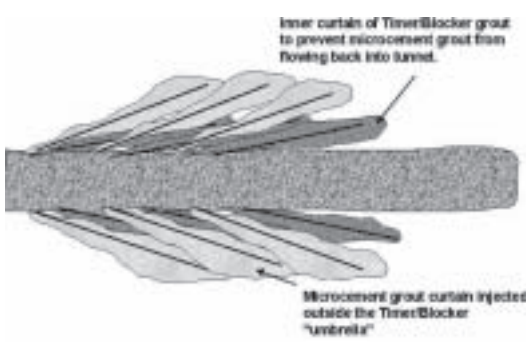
Blocker Grout placed to create a grout curtain outside of the tunnel profile and the area of High Performance Grout
